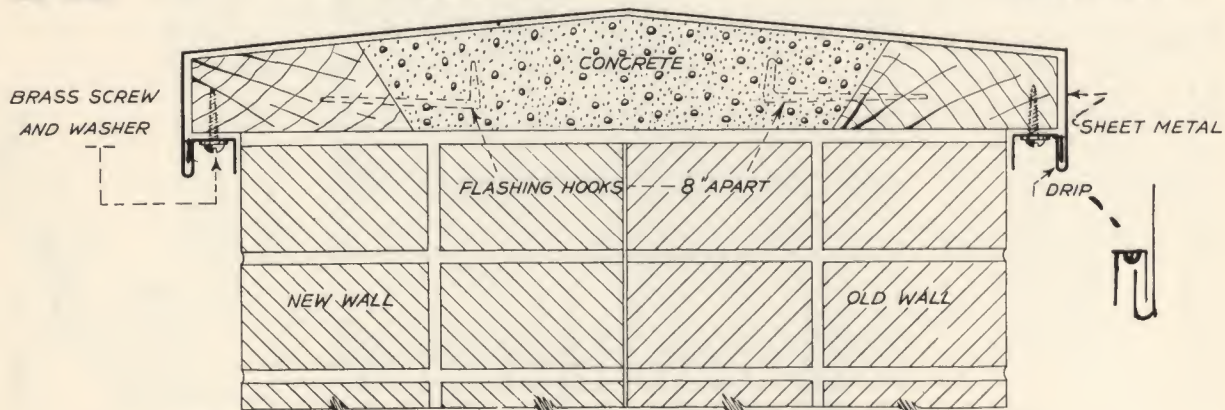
SHEET METAL COPING ON OLD WALL BELOW NEW WALL
